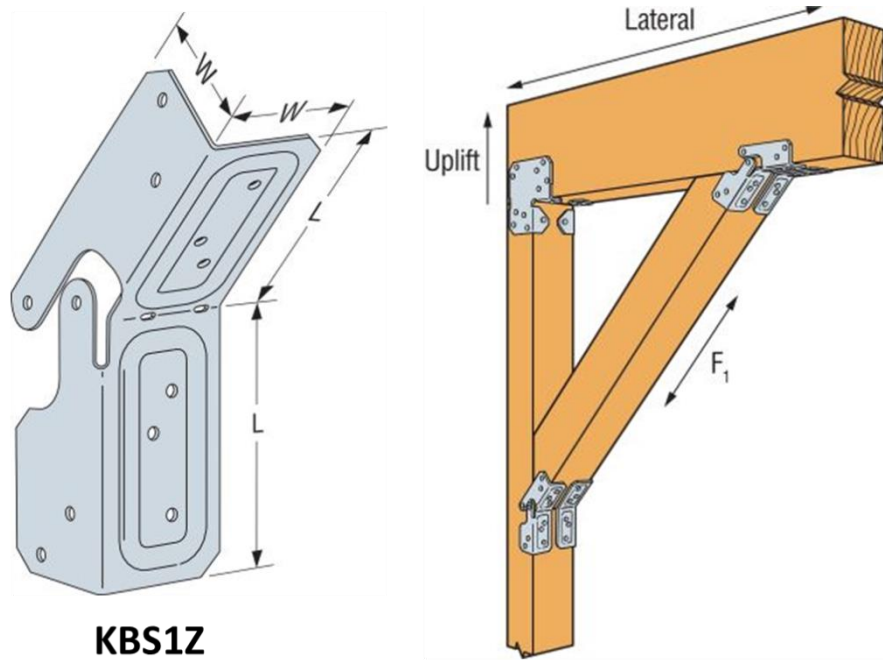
Diagonal brace to girder connection from Retrofit Report.
